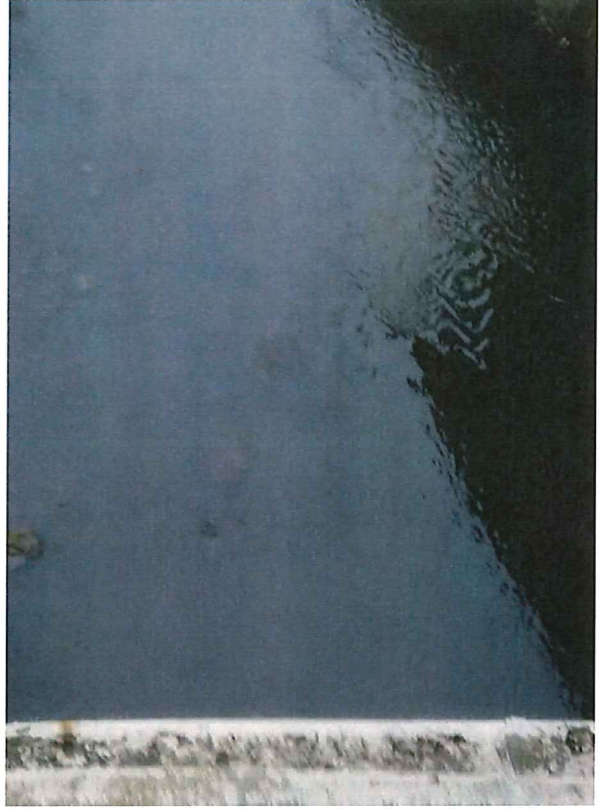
(Section 3 – Looking down from W Maumee Street Bridge): Shallow rocks under bridge
